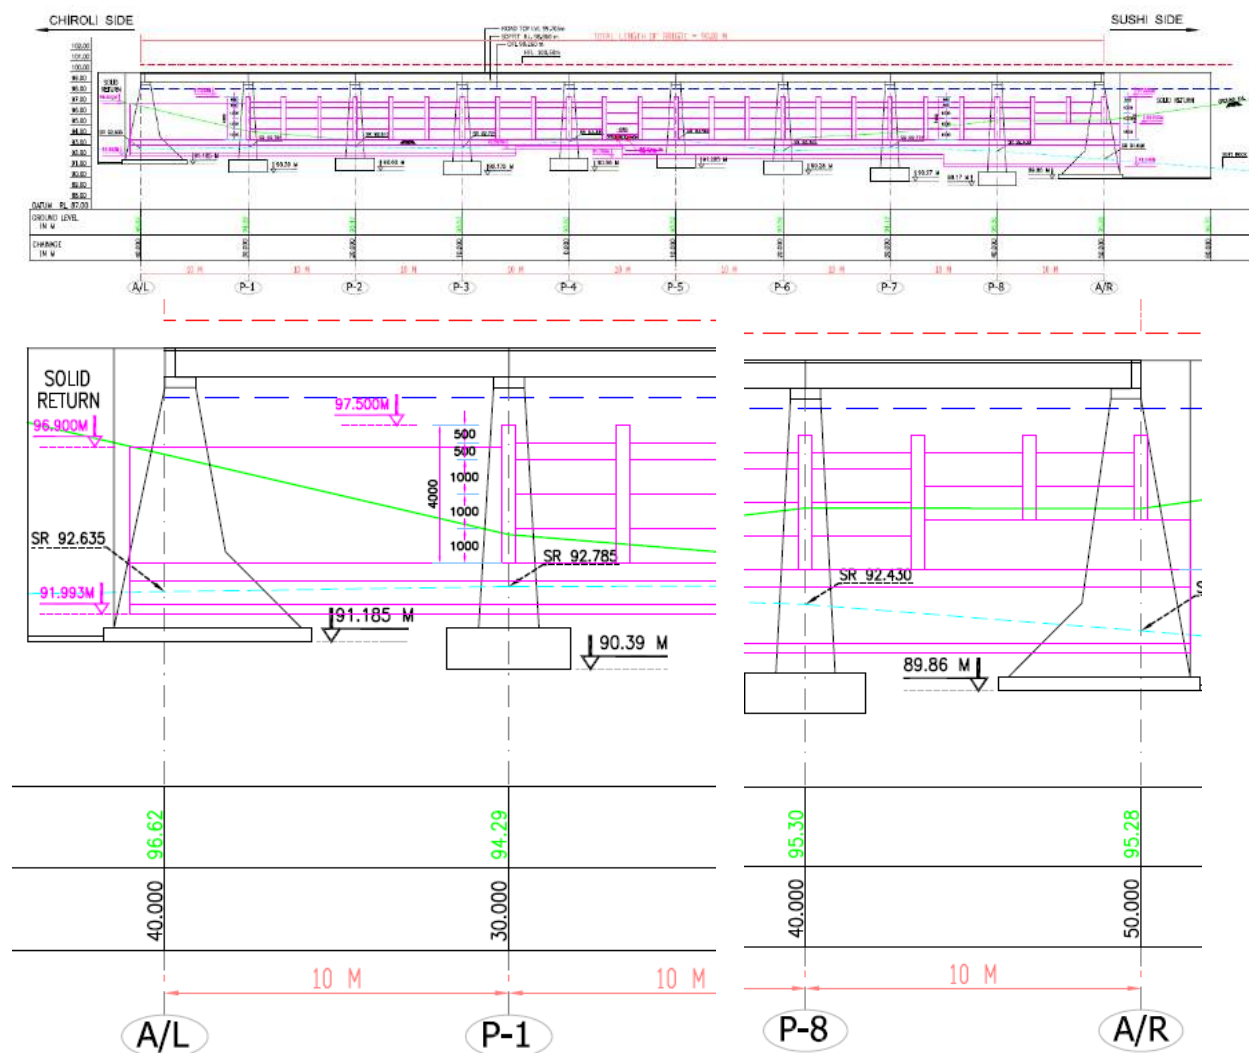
Proposed overflow weir between P8 and A/R with few gates and A/L to P1 full overflow weir
